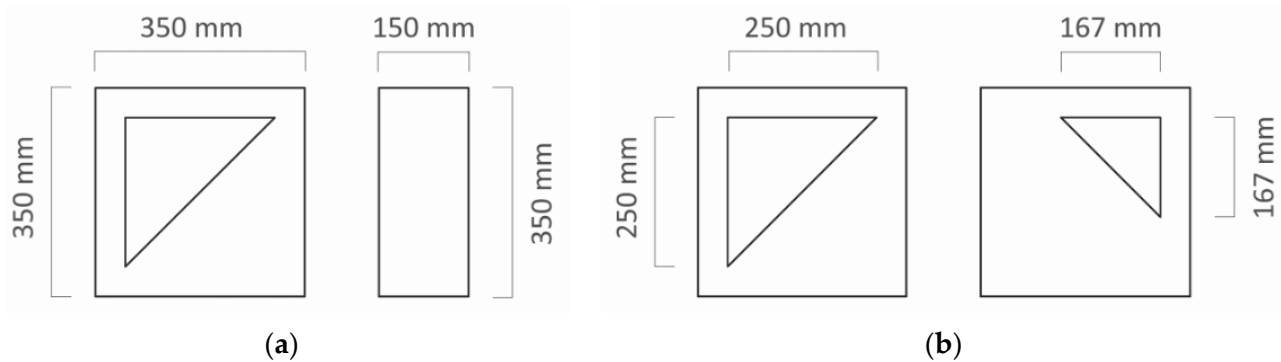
Dimensions of individual block design elements: (a) main dimensions; (b) dimensions of the designed opening.
